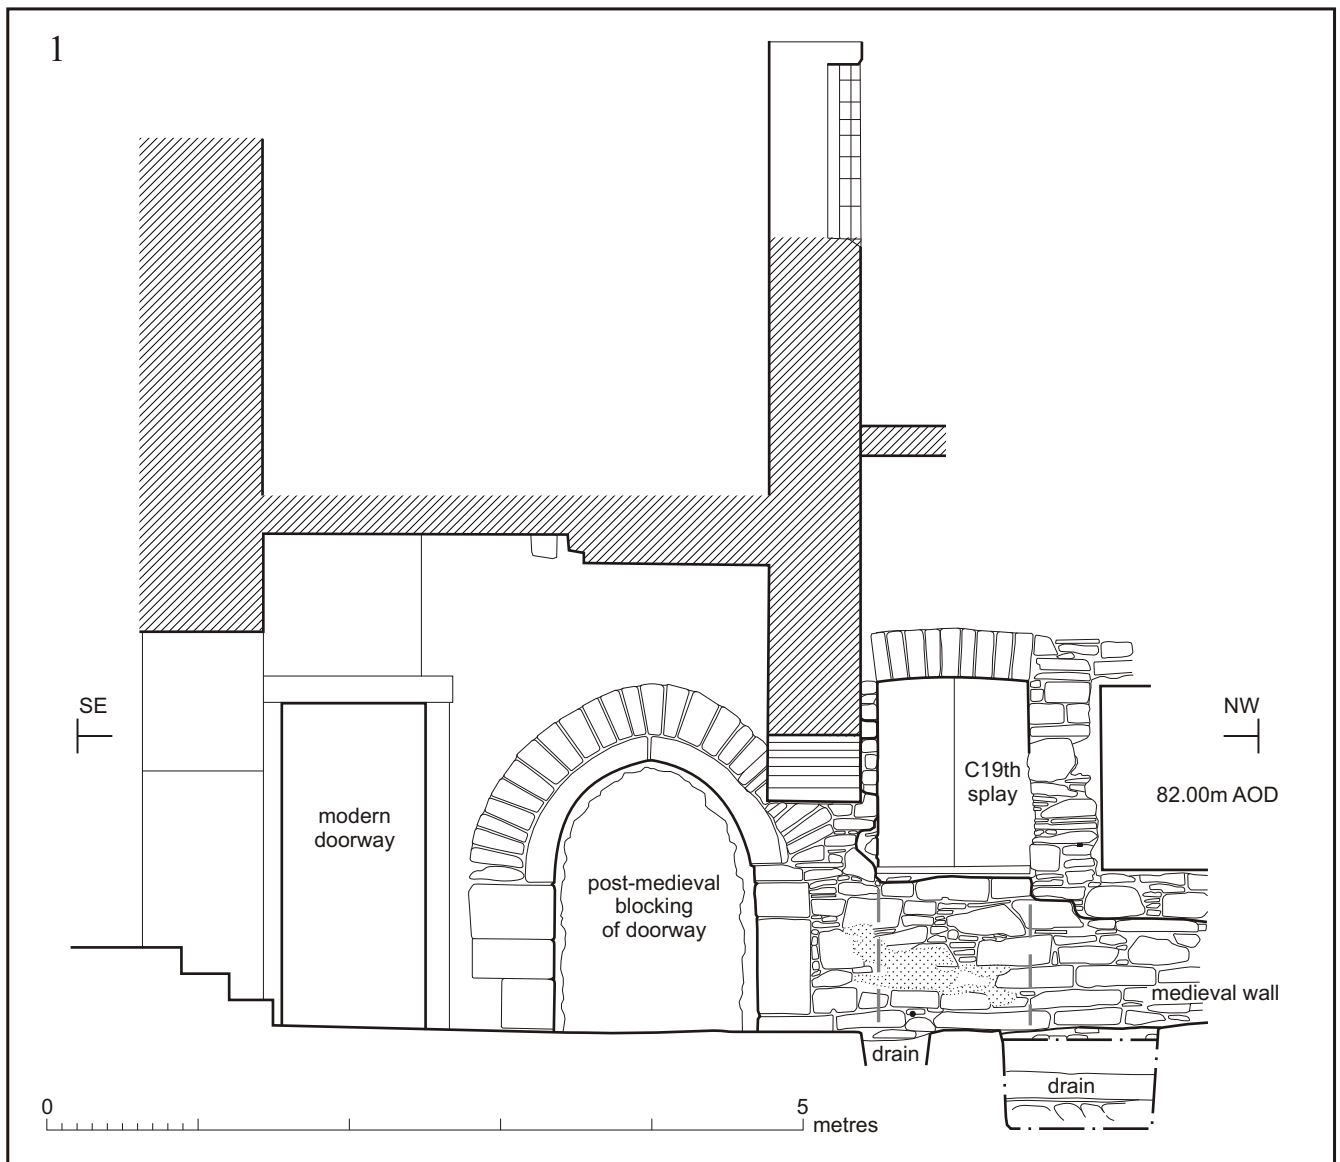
West courtyard wall: exterior elevation (grey vertical lines below the C19 window show extent of removed fabric).
